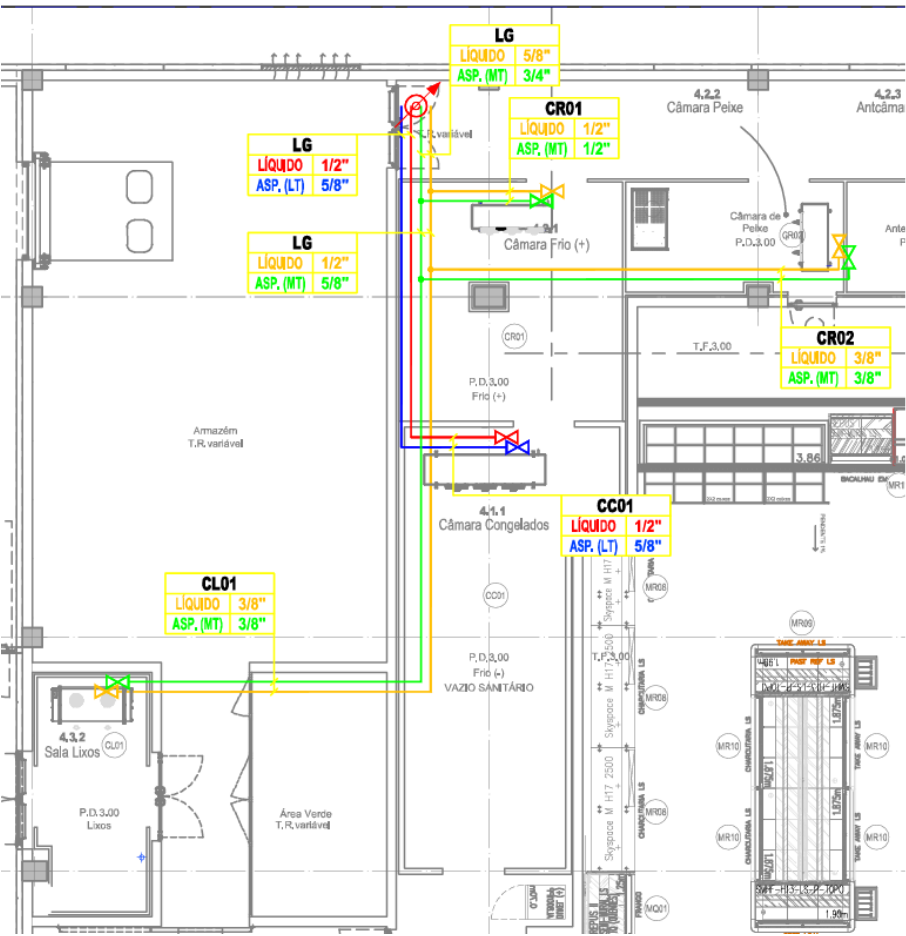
Piping system for cold storage rooms on the ground floor.
